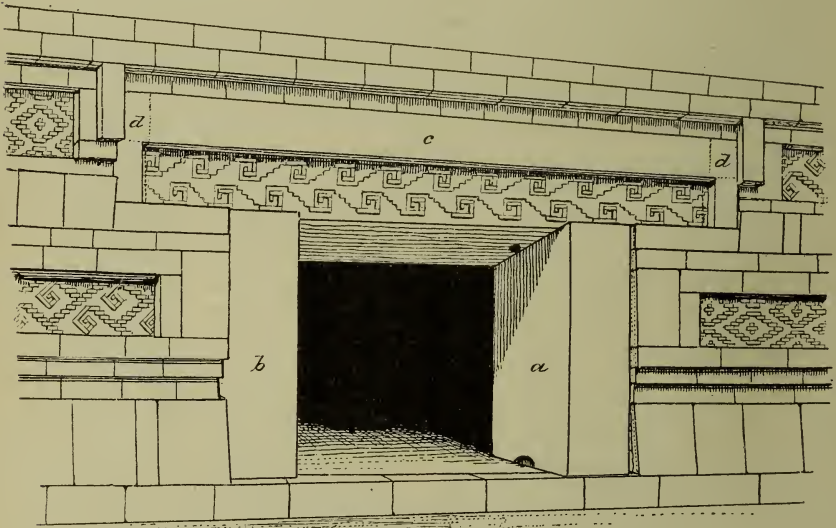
CONSTRUCTION OF SINGLE DOORWAY, EMPLOYED WHERE SPACE WAS LIMITED.
